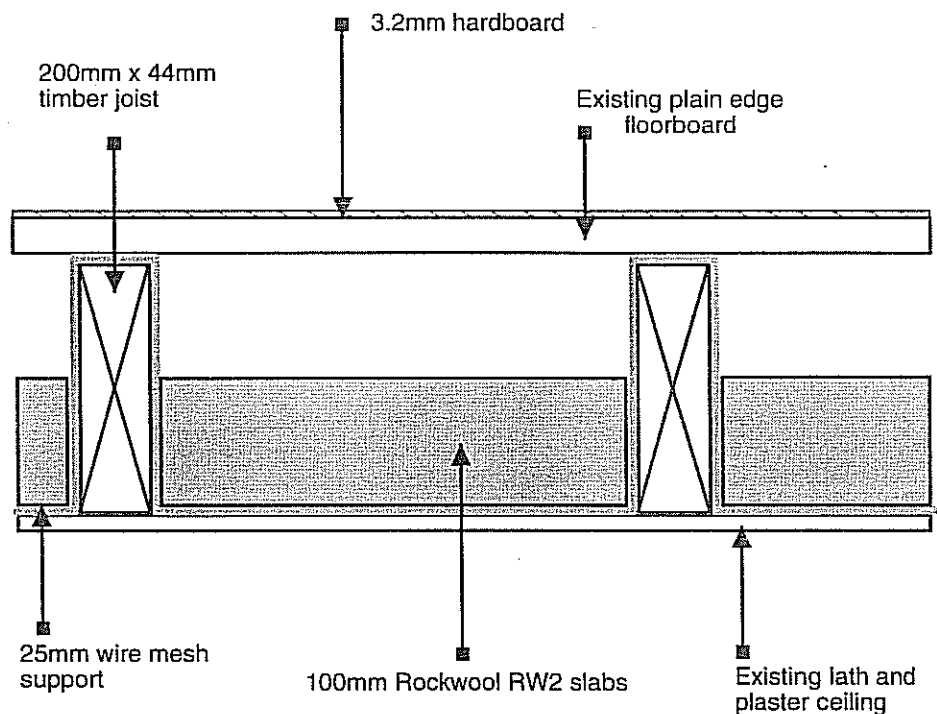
Use of Rockwool Slabs above an existing ceiling to provide 60 minutes fire resistance
